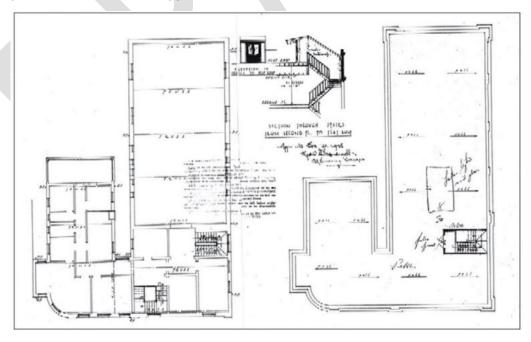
Revised section showing the proposed flat roof and parapet addition. (Source: City of Sydney Archives, 0540/25, Sheet No. 5)
